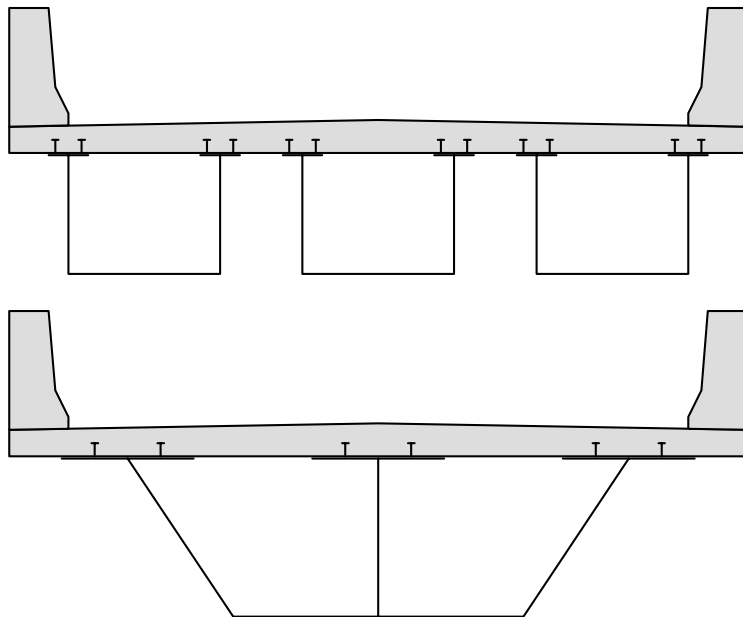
Box Girder Cross Section with Composite Deck
